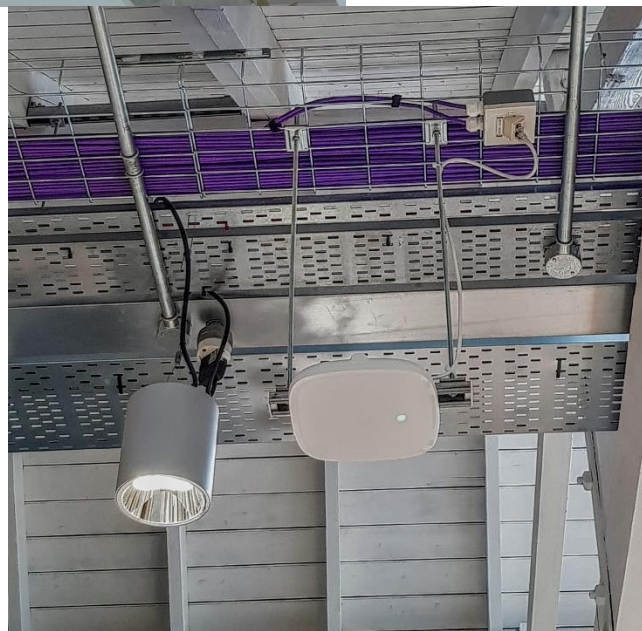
1 AP installation on exposed soffit and/or no ceiling
